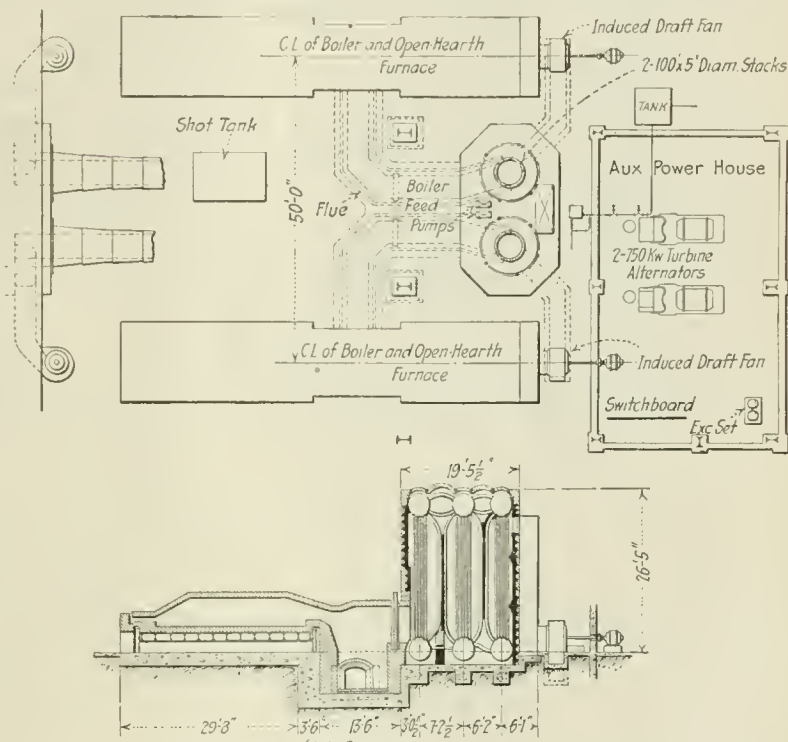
PLAN AND ELEVATION SHOWING ARRANGEMENT OF OPEN-HEARTH FURNACES WITH WASTE-HEAT BOILERS AND AUXILIARY POWER PLANT
